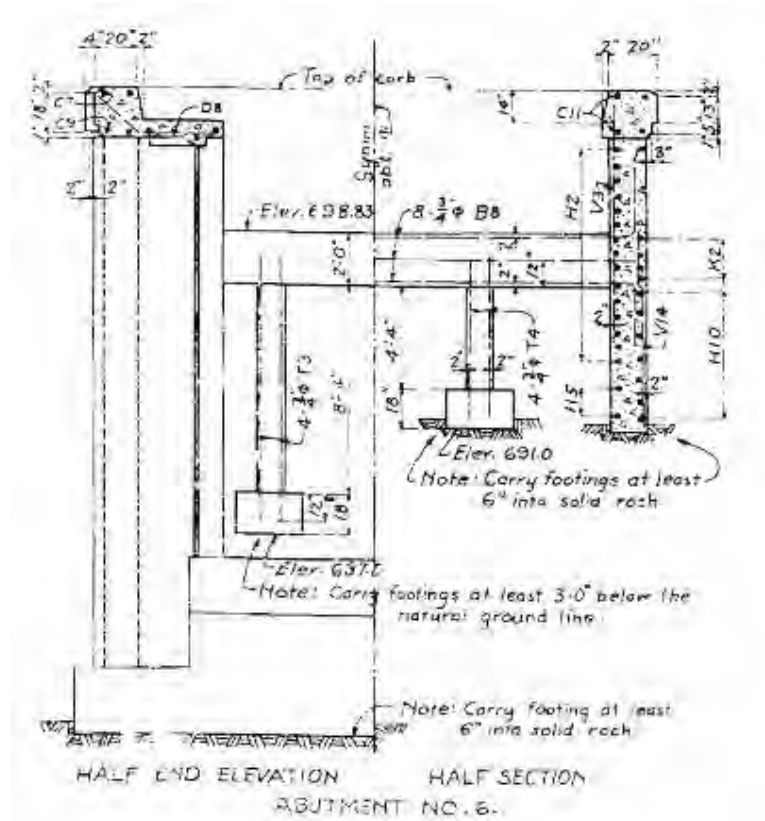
Current River Bridge (G0804) Typical Section through Filled Abutment Houses
